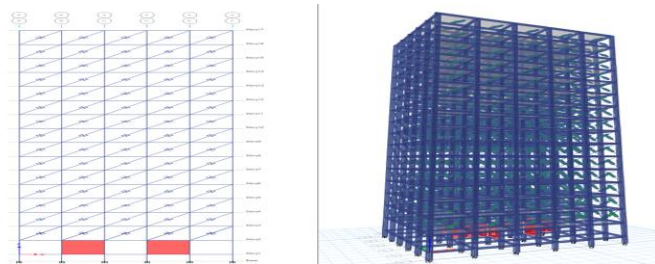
(G+15) storied building with infill wall and shear wall in open ground storey.
